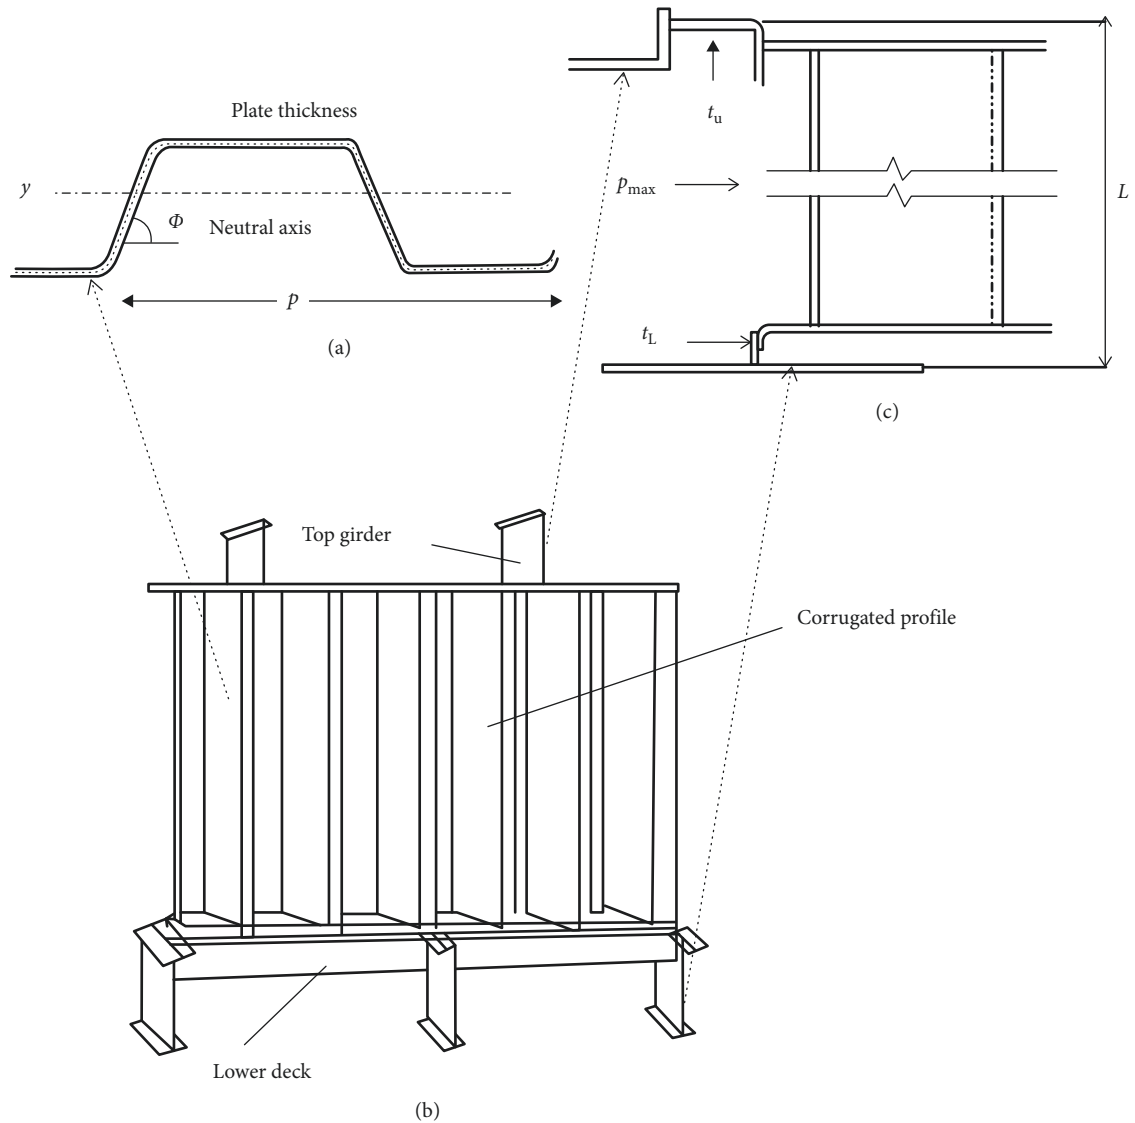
(a) Cross section of the (b) blast wall (front view) and (c) upper and lower supports.
